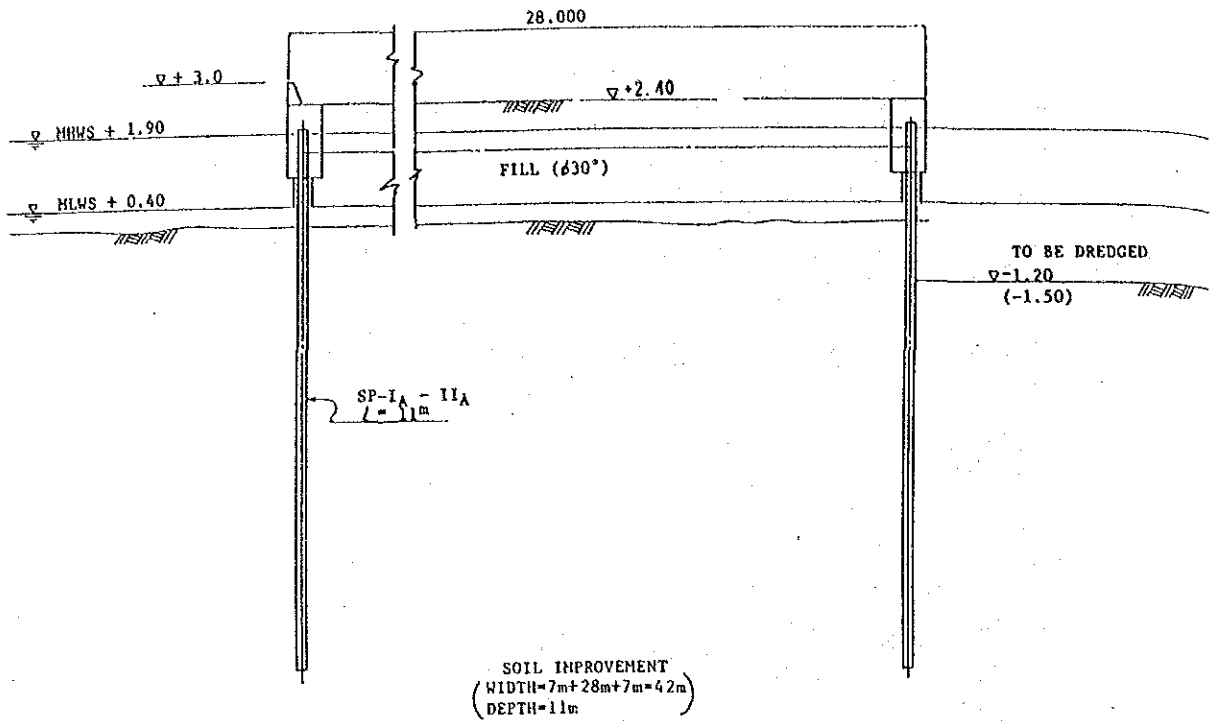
, TYPICAL SECTION OF MAIN JETTY
